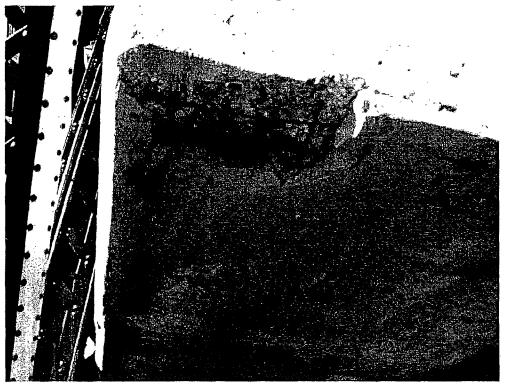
Cracking and spalling on the above ground counterweights, typical
